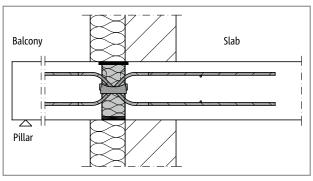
Schöck Isokorb® T type Q-E-VV: Connection for exterior insulation
